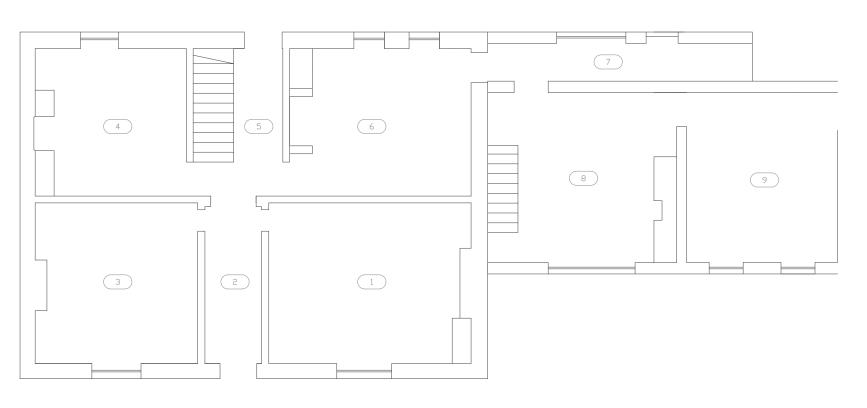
Farmhouse, South Range, Ground Floor Plan
